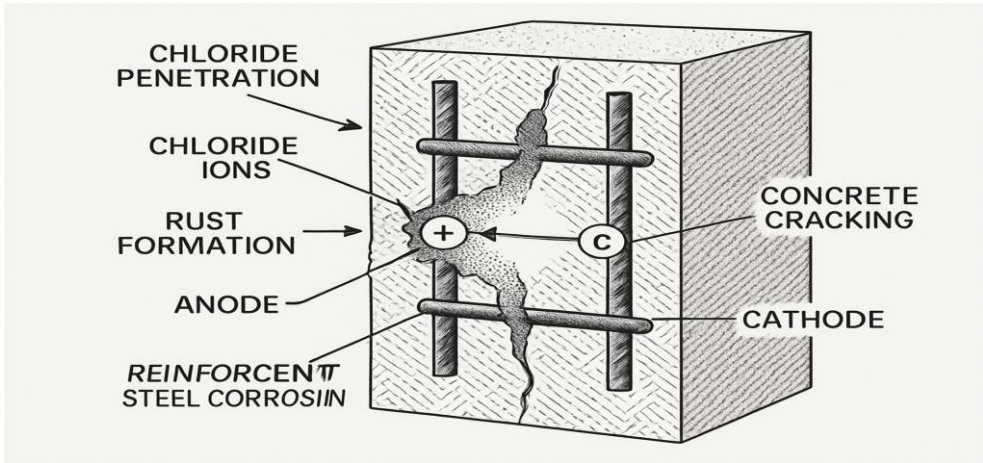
Schematic representation of reinforcement steel corrosion in concrete columns, showing chloride penetration from the environment and resulting concrete cracking
